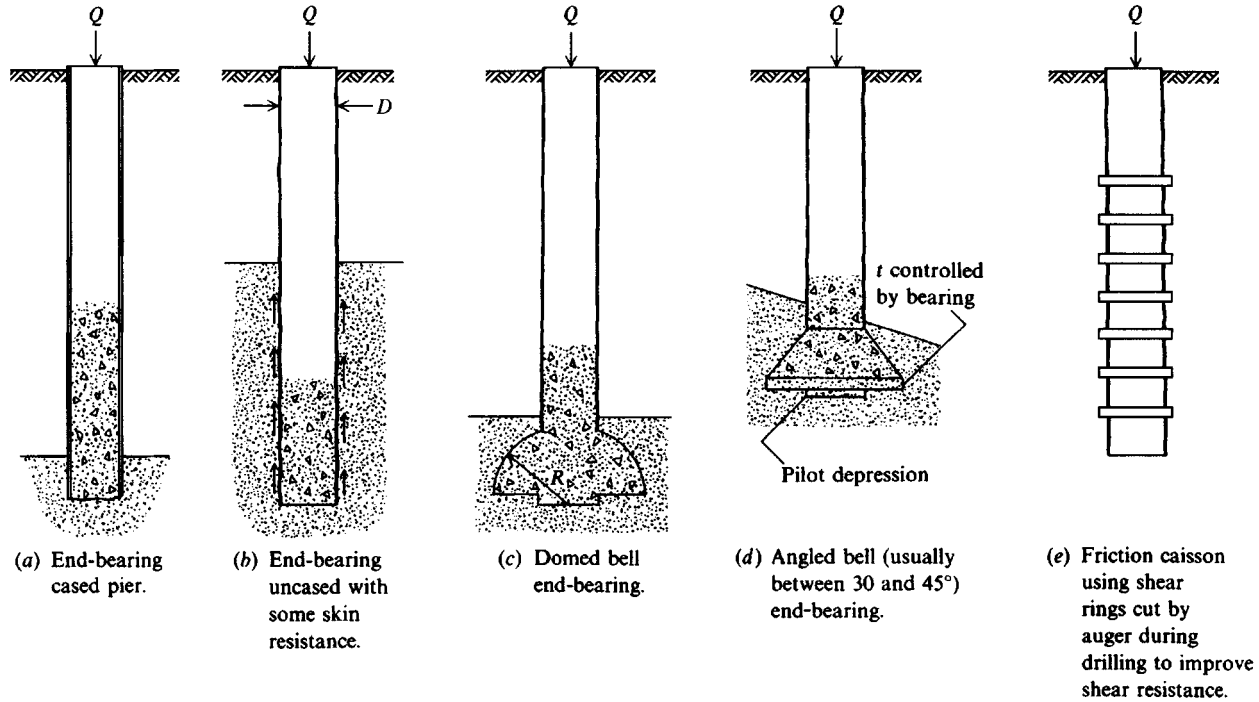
Common drilled pier configurations. Such a structure is considered a pile if shaft diameter $D < 760$ mm; a pier if $D > 760$ mm.
